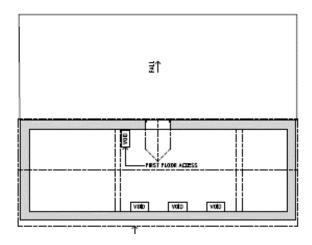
Stable. Existing Attic Plan (Source: GB&A 2012)
